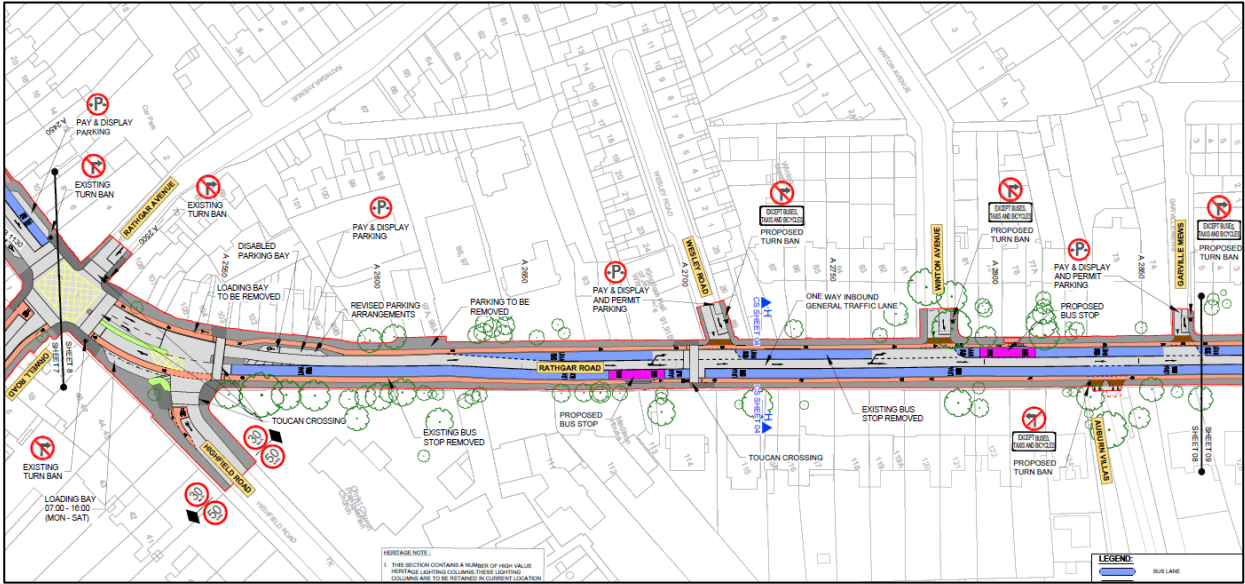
Extract from General Arrangement Drawings (Sheet 8)
